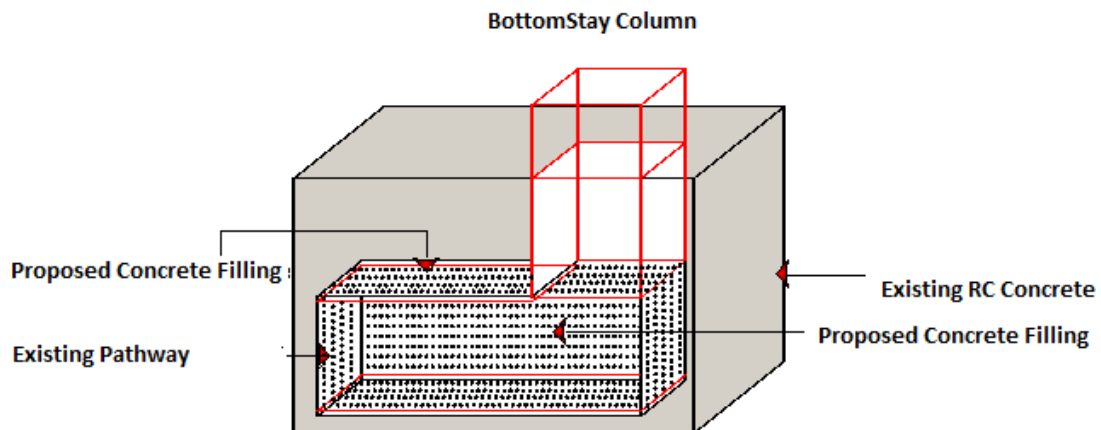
Modified foundation Layouts with Proposed Concrete filling
